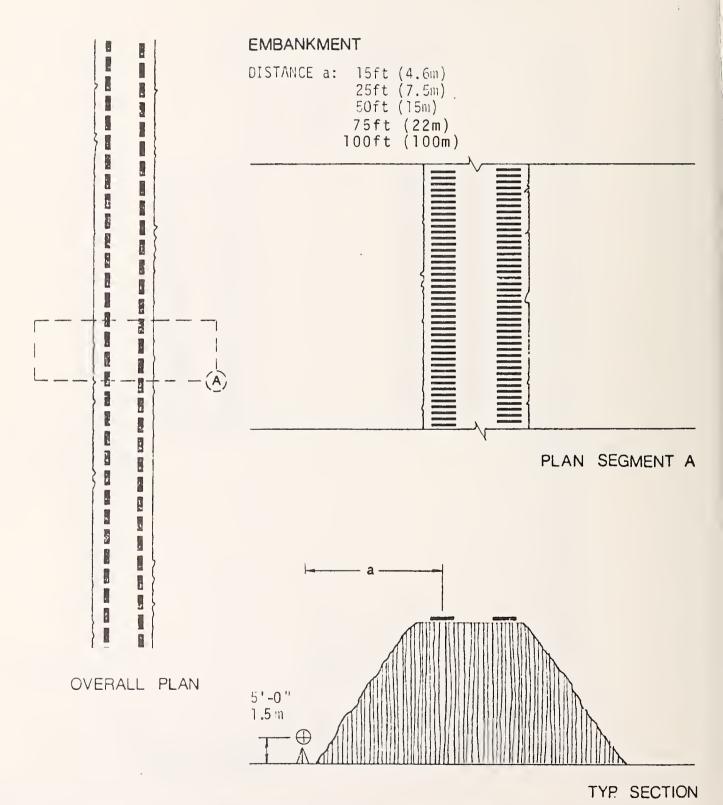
Wayside Measurement Location Adjacent to Embankment Sections
